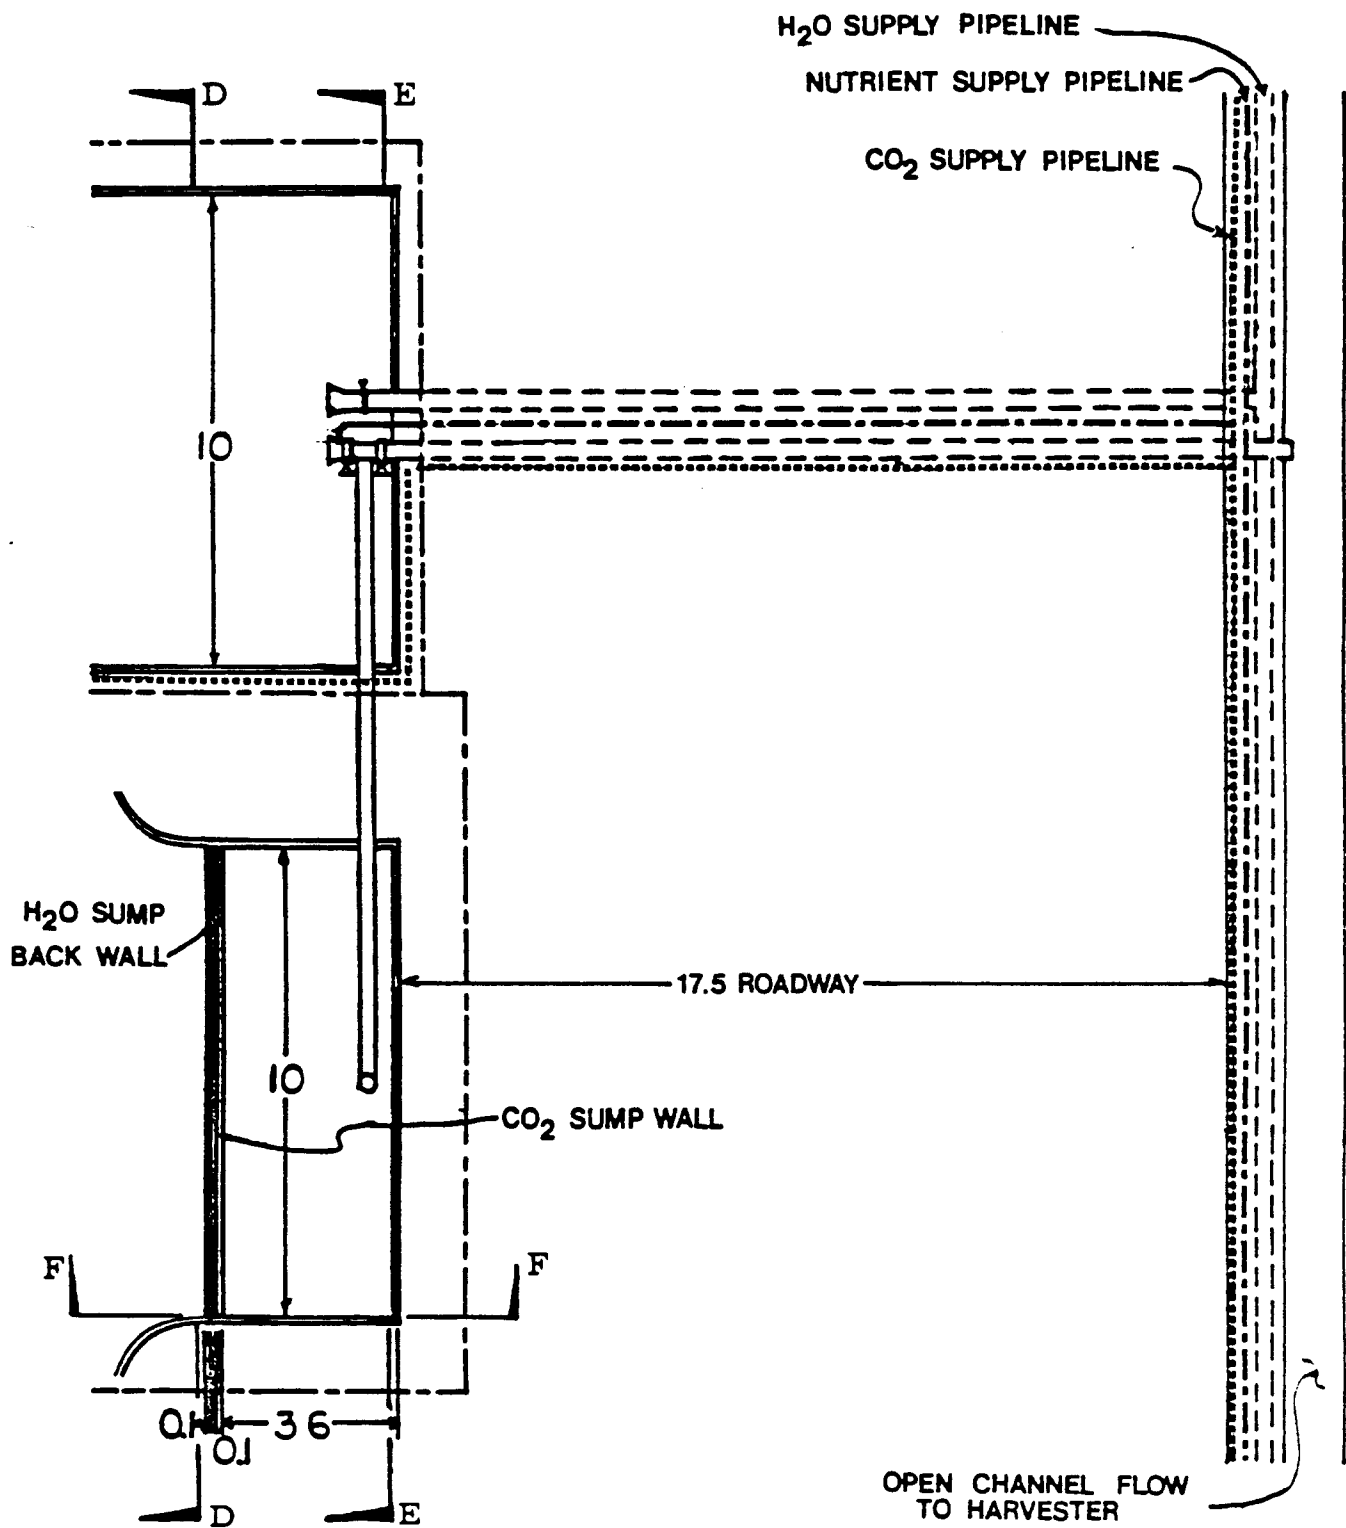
Overhead view of sump end of raceway showing pump, supply pipes, and harvest channel. Dimensions are in meters.
